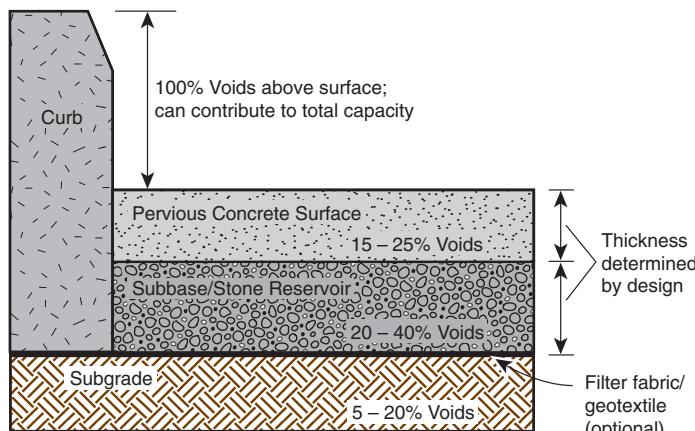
Typical cross-section of pervious concrete pavement. On level subgrades, stormwater storage is provided in the pervious concrete surface layer (15% to 25% voids), the subbase (20% to 40% voids), and above the surface to the height of the curb (100% voids). After: ACI 552R-06.
